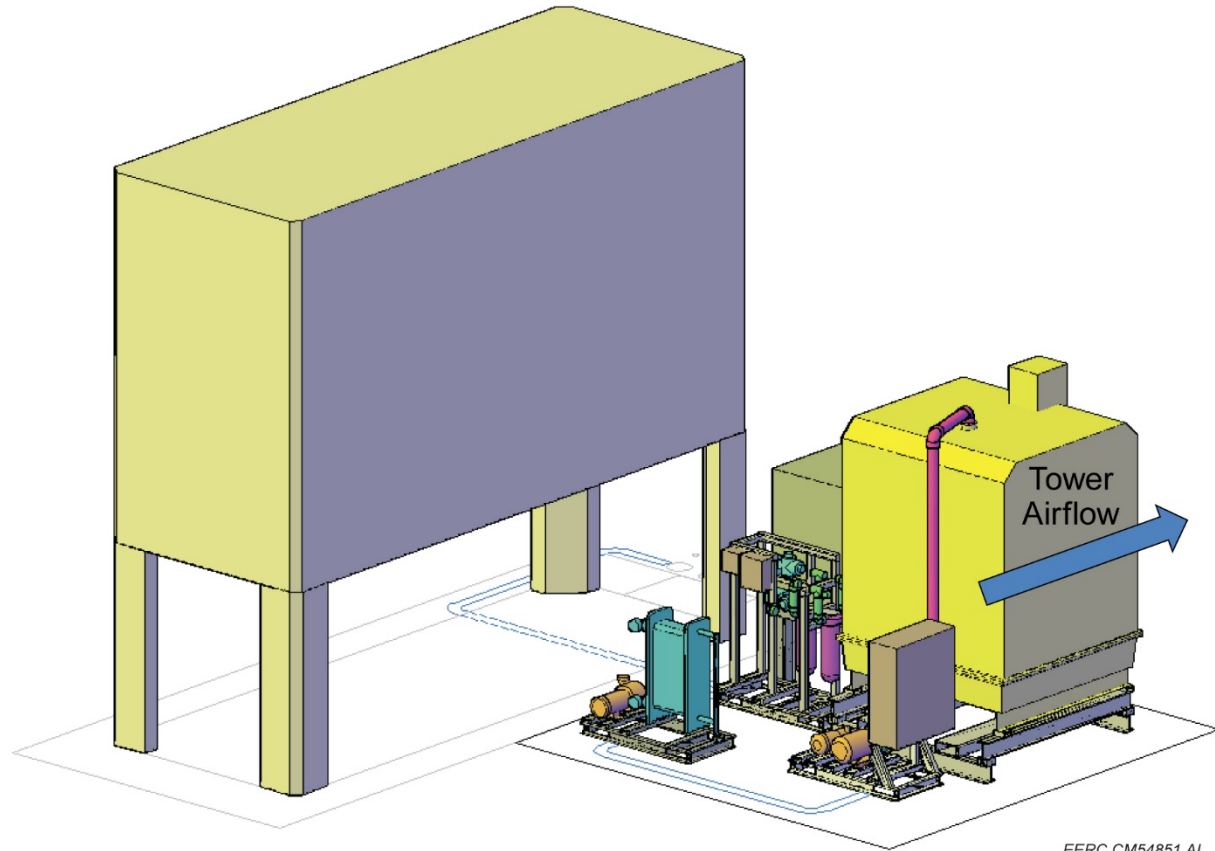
Plan view of the DCMB demonstration cooling tower equipment next to the existing tower and pad (shown in the same orientation as in Figure 6).
